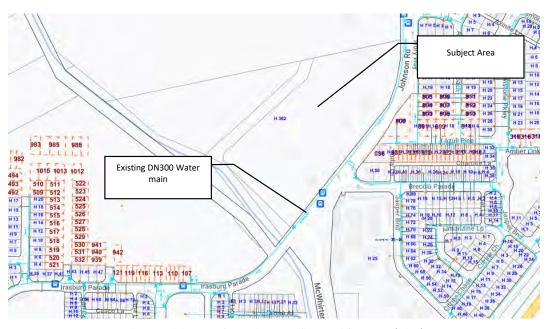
Existing Water Corporation surrounding water infrastructure (Esinet)
